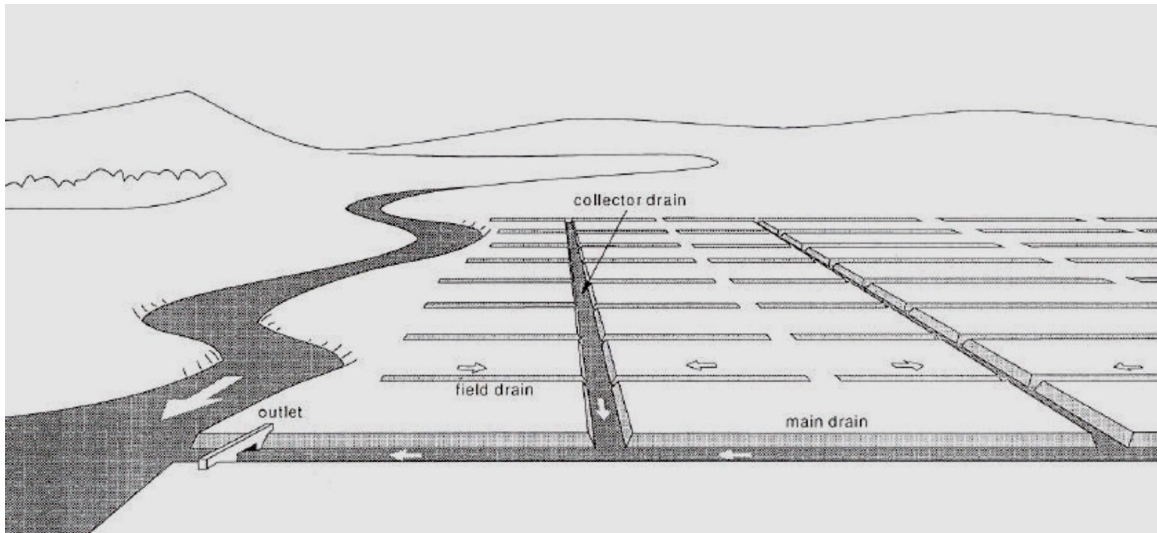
Simplified diagram of a typical surface water drainage system to remove excess surface water (Source: Ritzema et al., 1996)
